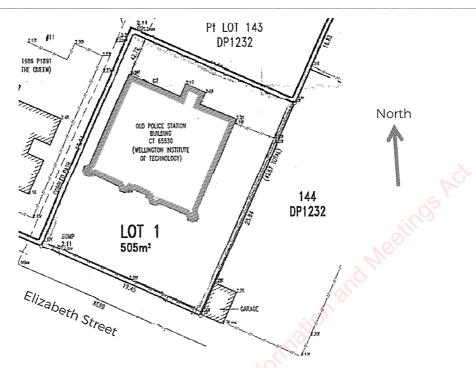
Site Plan of Old Court House Building at 13 Elizabeth Street, Petone
